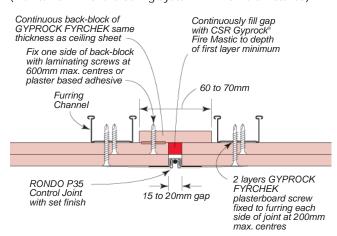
CONTROL JOINT PERPENDICULAR TO STEEL FRAMING – 2 LAYERS
